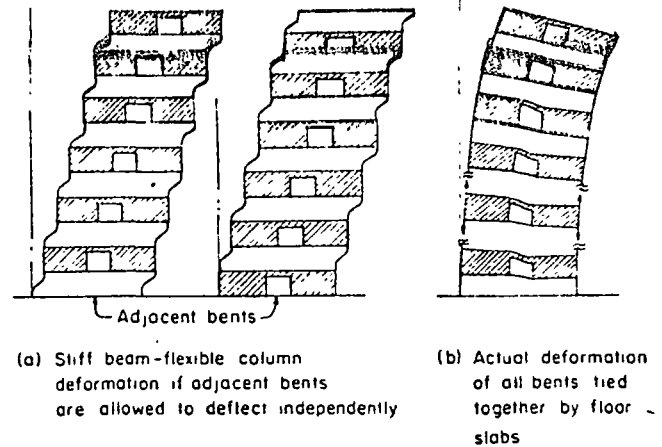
Deformation of staggered wall-beam frames under transverse lateral load
